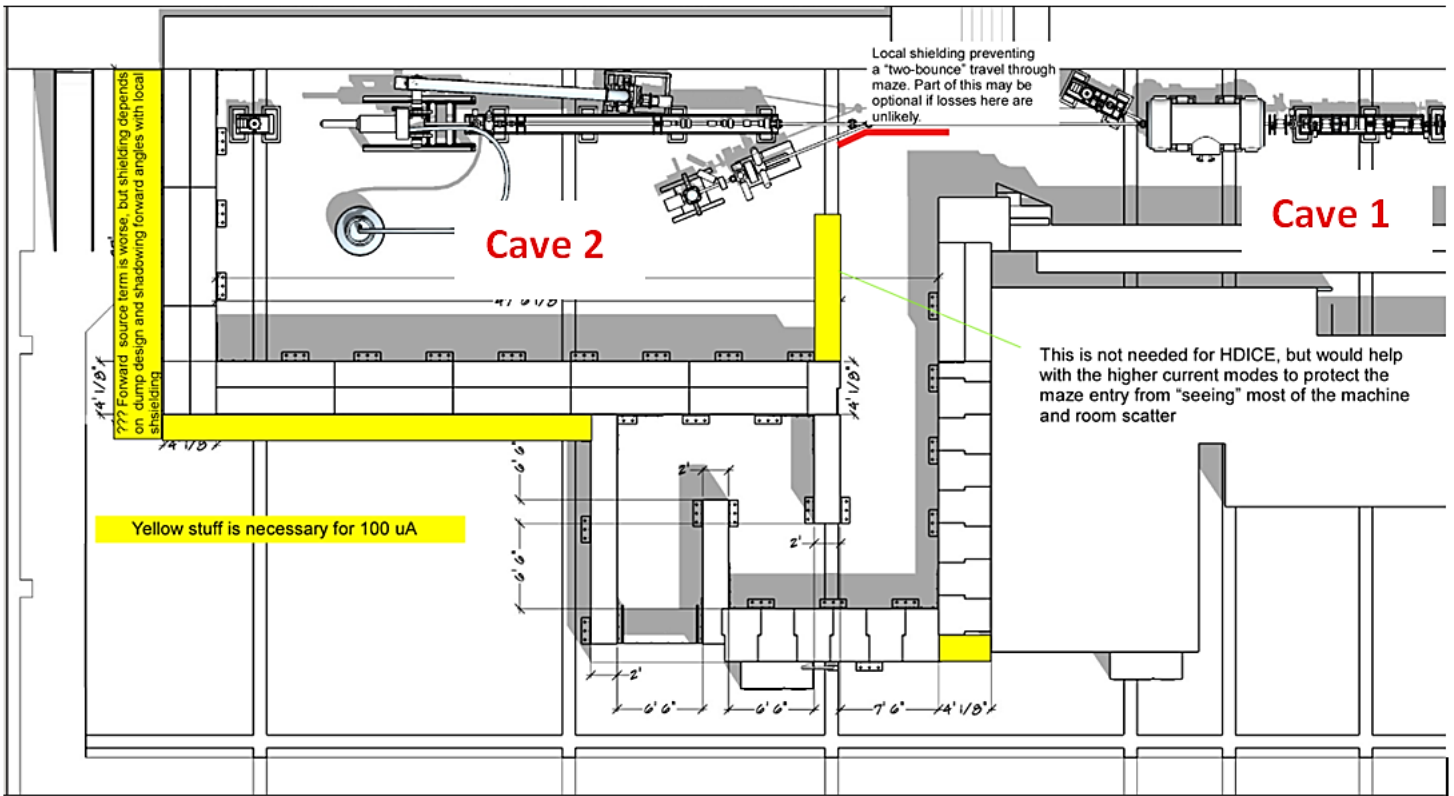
UITS beamline layout showing the two Caves. keV beam is confined to Cave 1
